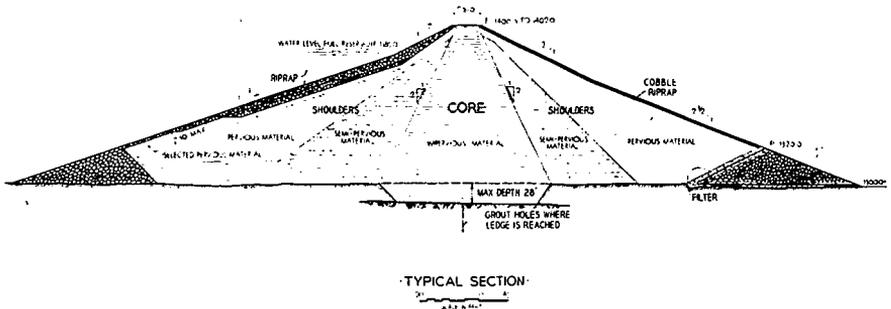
TYPICAL SECTION OF EARTH EMBANKMENT
